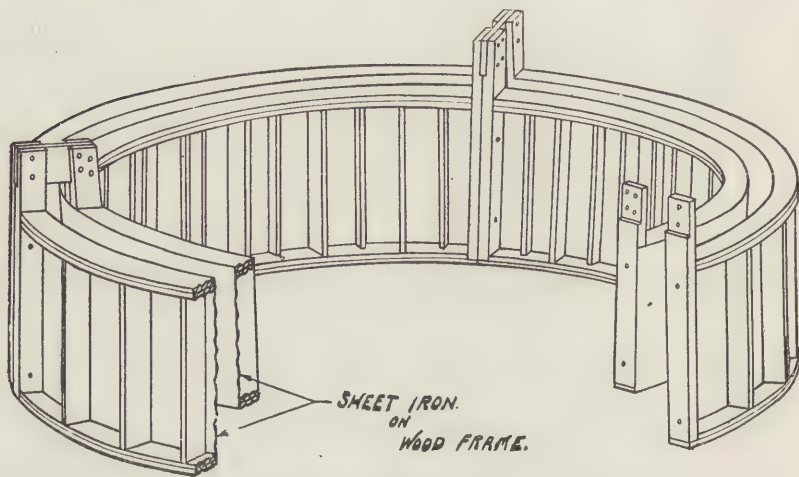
A circular form can be made of sheet steel supported on a wooden frame work. The inner form is suspended from the outer as shown.
